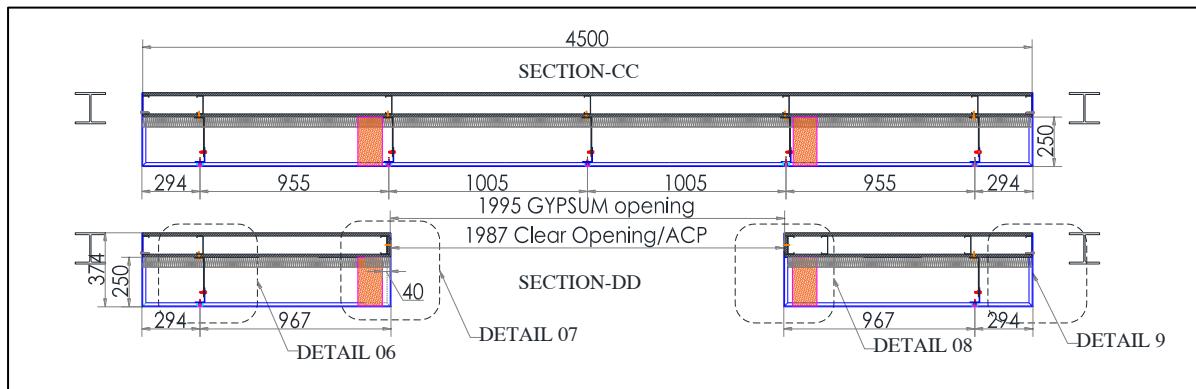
Elevation view of the horizontal and vertical runner profile.
